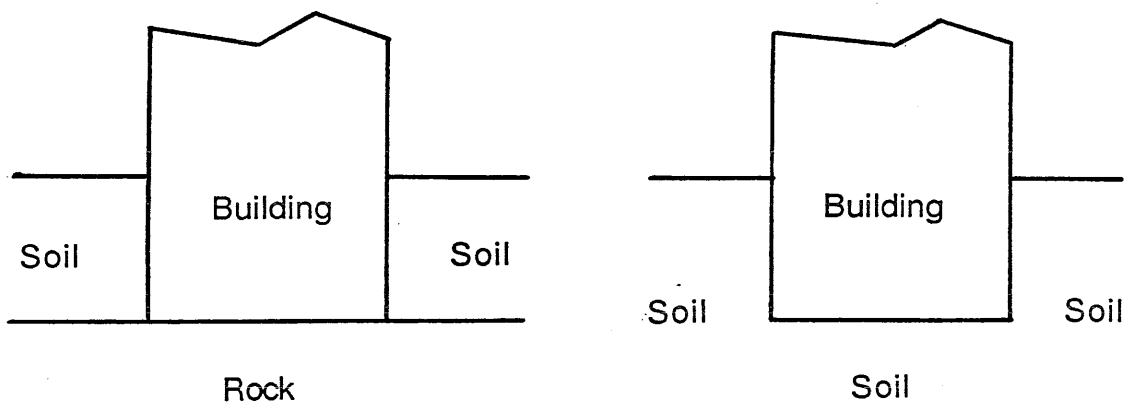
Embedded Foundation Founded Upon Rock (a) and Upon Soil with Same Stiffness as Backfill (b).
